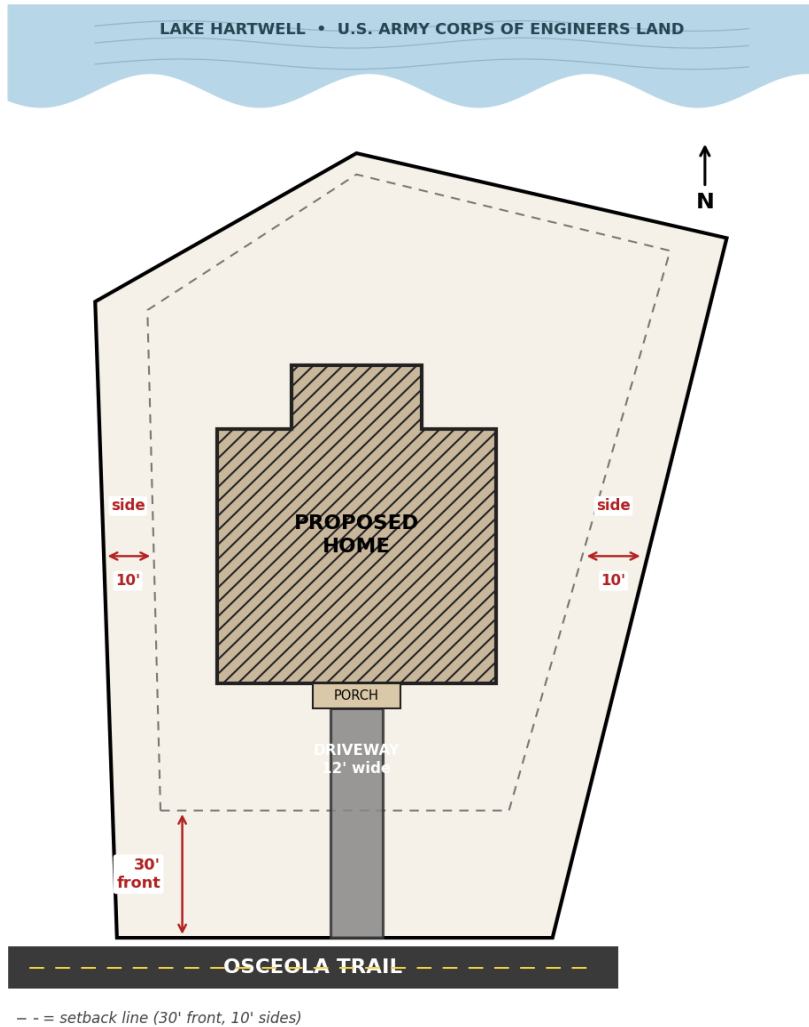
Example site plan showing the lot as an irregular polygon with road frontage at the front and Lake Hartwell shoreline at the rear. Required setbacks (30' front, 10' sides) are shown dashed; driveway location and width and the house footprint are dimensioned. Lot shapes and sizes vary throughout the neighborhood; submissions must reflect the actual surveyed boundary of the subject lot.
